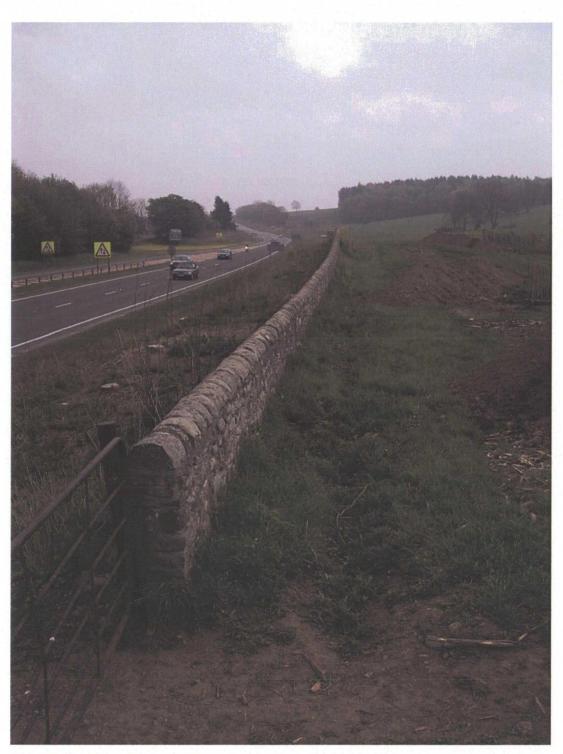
Site 019, wall opposite Thorpe Farm to the south of the carriageway, looking south-east. The wall is mortared and of a different style from the drystone walls, but of a similar style to the culvert headwalls, and is probably late twentieth-century in date
